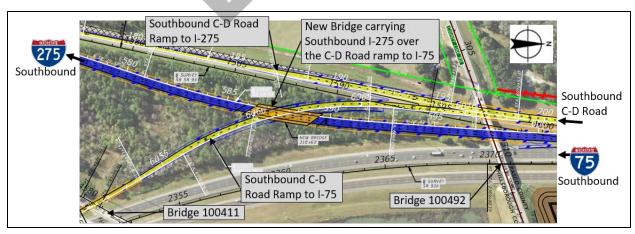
Alternative 2B-C-D Road Diverge & New I-275 Bridge over C-D Road Ramp
